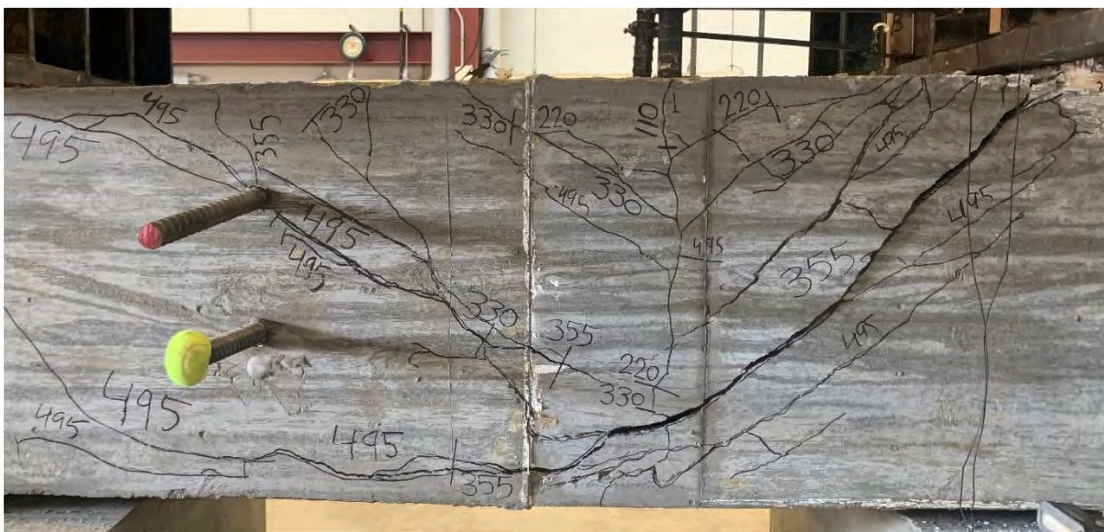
Anchorage failure observed in specimen 14-2A ($A_{tt}/A_{hs} = 0.267$) tested under loading condition B
